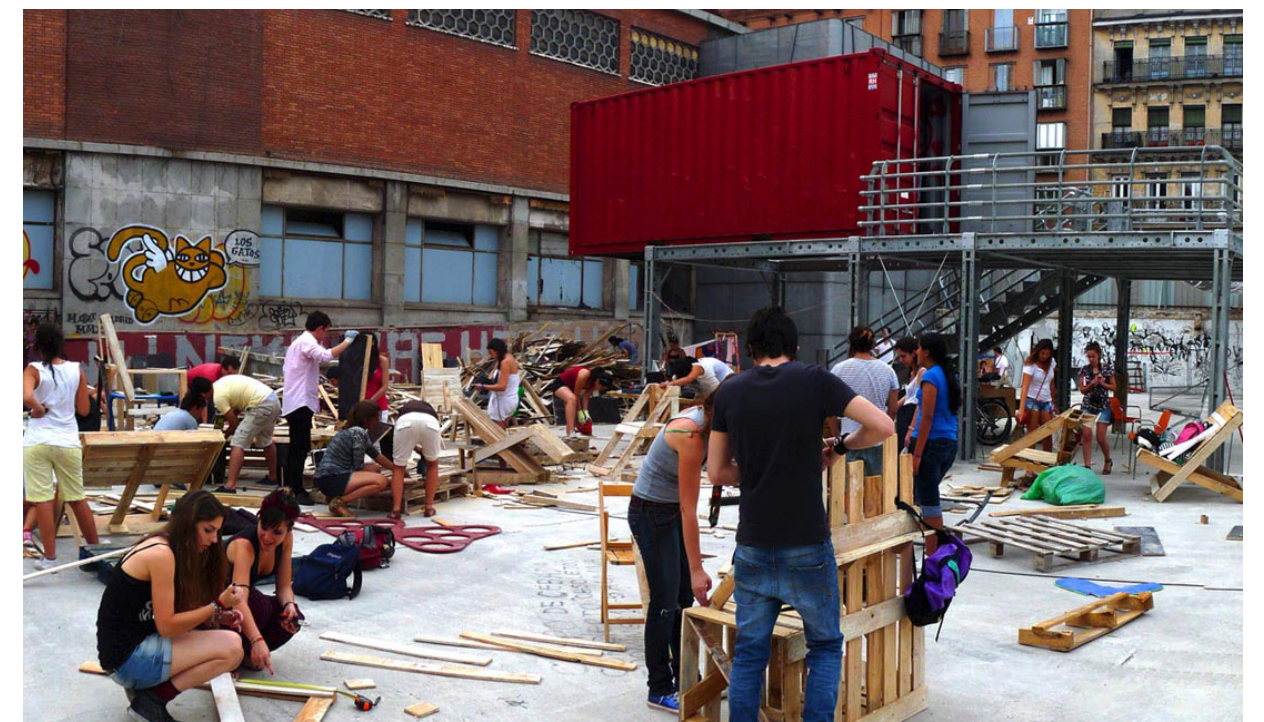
Showing the collective building process on site and mutual aid in building, with "handmade urbanism" workshops available. Street furniture are all created out of recycled materials
